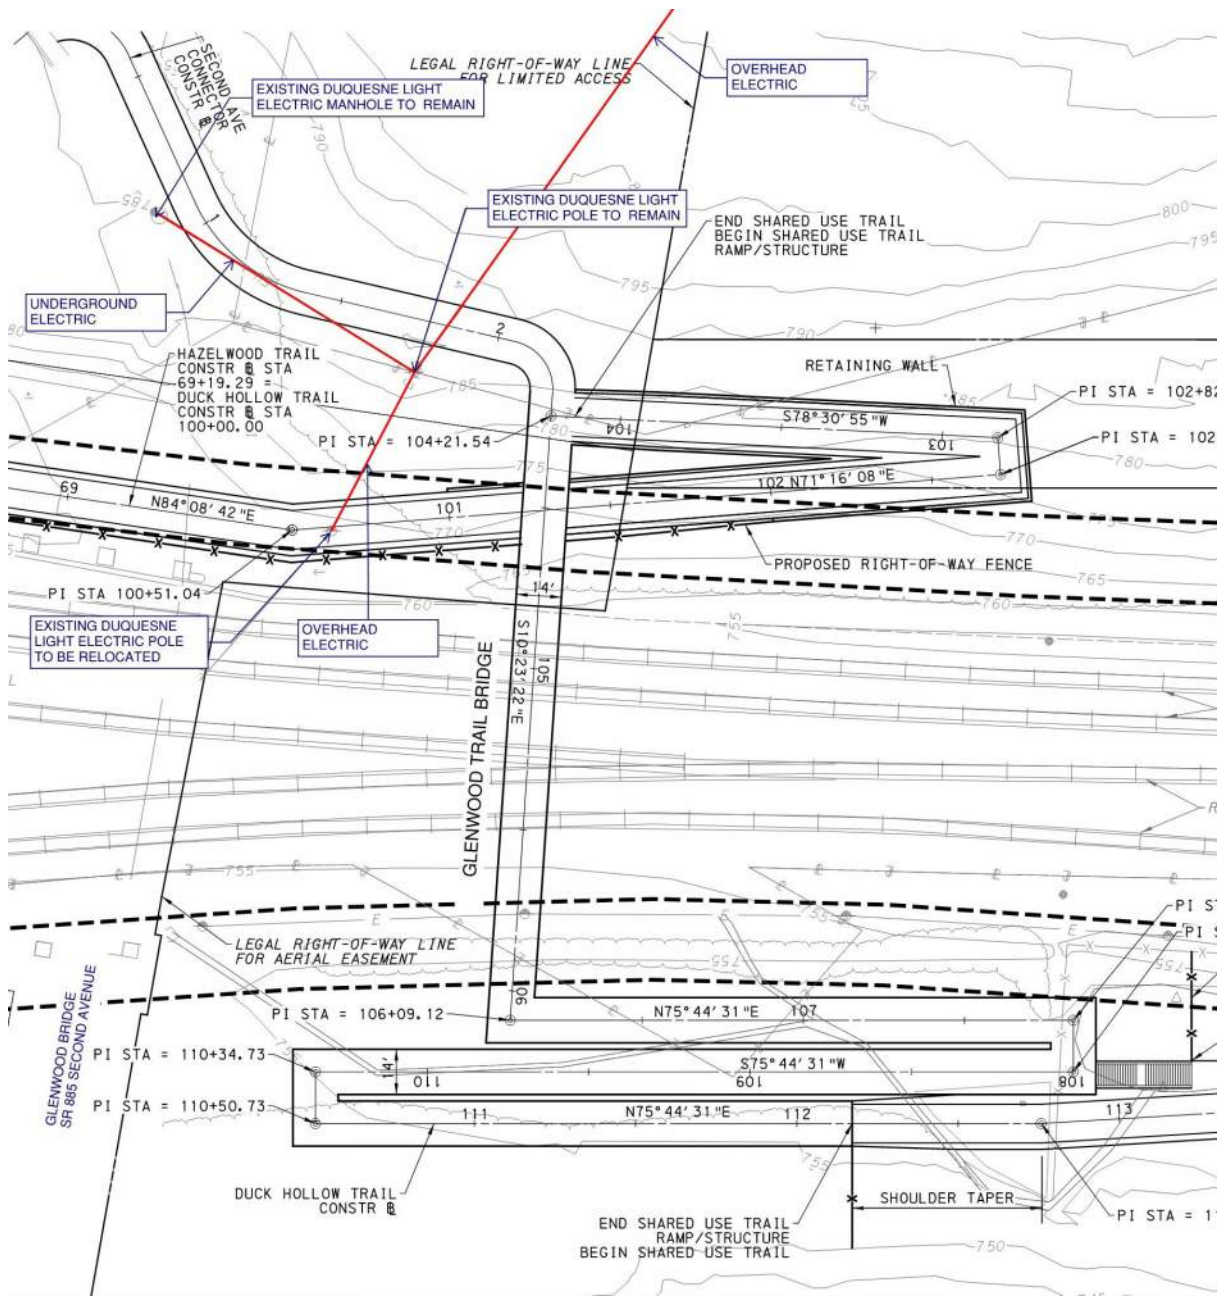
Duquesne Light impacts at the Glenwood Trail Bridge
